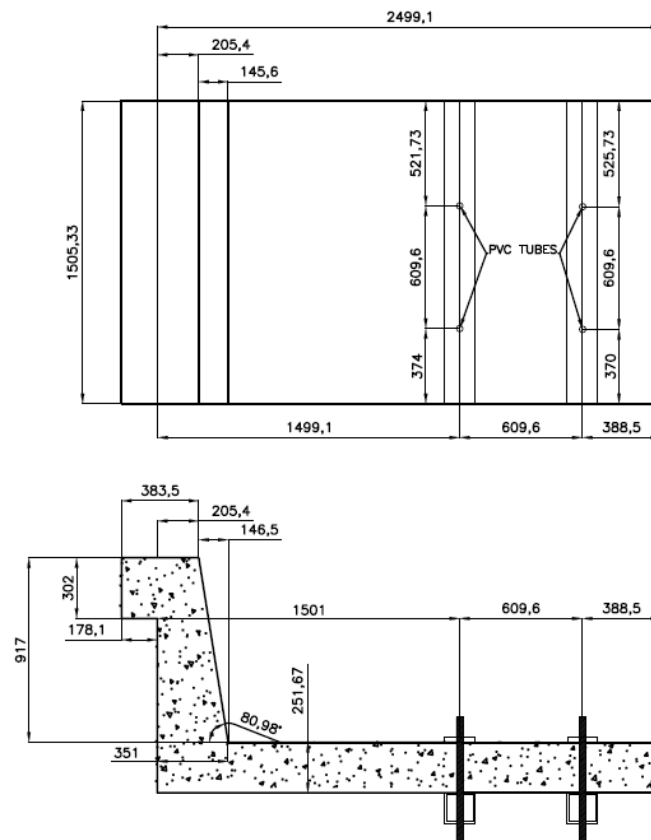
As-built dimensions for SP-04. All dimensions in mm.
